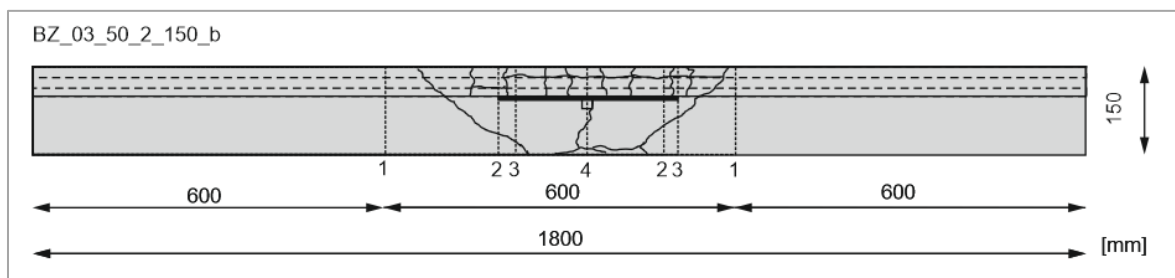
Example of a crack pattern in bendingtests under static load, 1 - bearing line, 2 – bond breaker, 3 - load line, 4 - beam centre.
